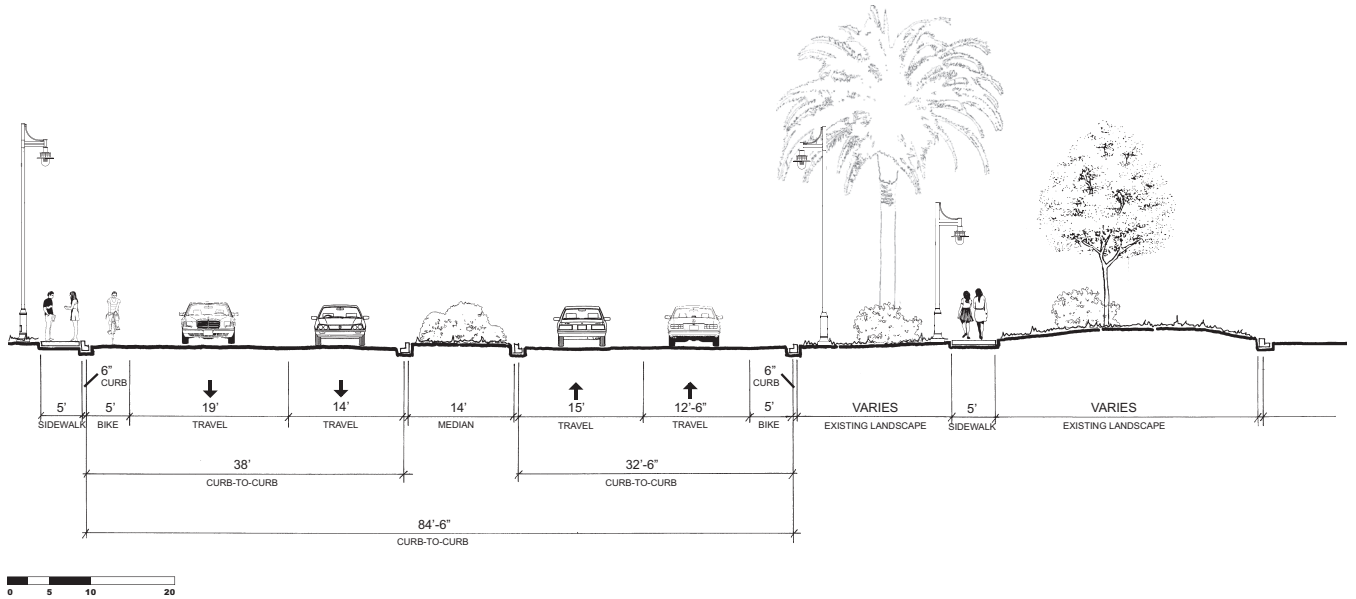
D.45: Section of Mare Island Way near Alabama Street ①
